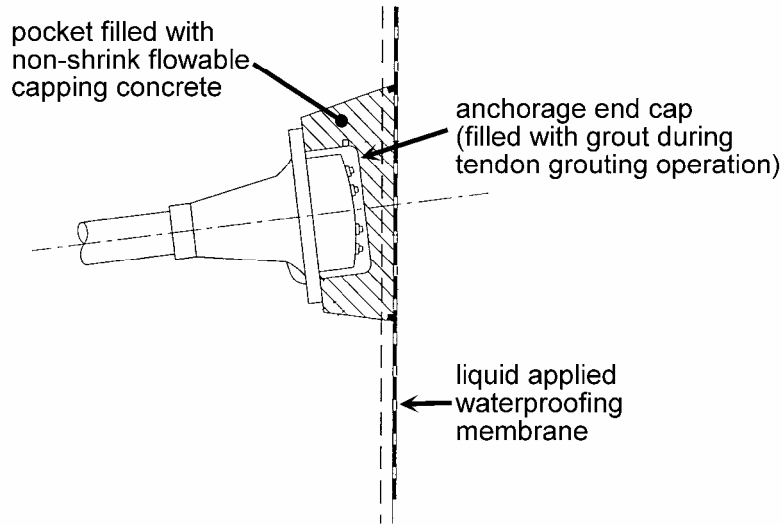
Multi-Layer Corrosion Protection for Buried Post-Tensioning Anchorages²²
